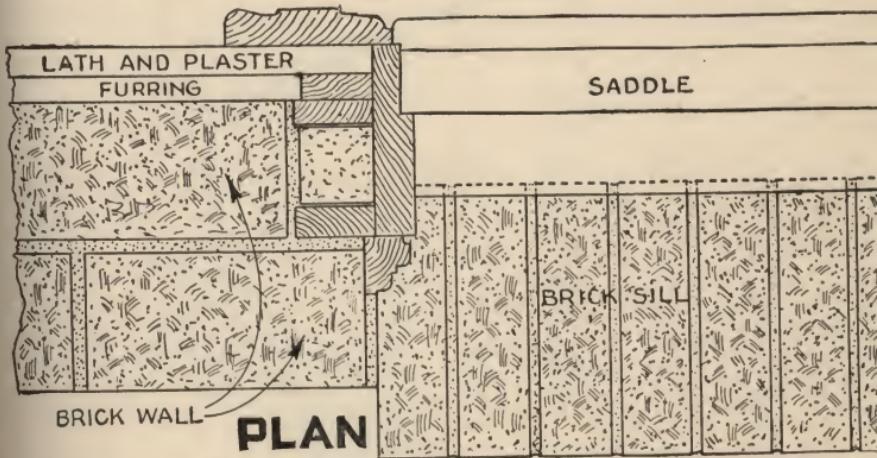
,297.—Enlarged plan showing sectional view of the door jamb of fig. 4,296.
